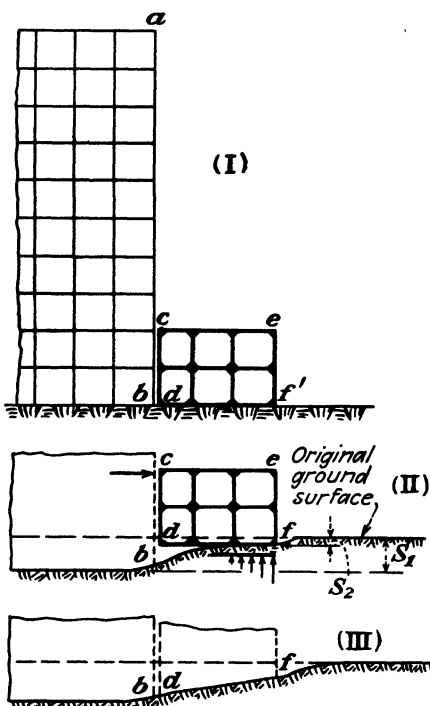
Sketch illustrating discussion of measures necessary to prevent damage to light parts of a building by the settlement crater around adjoining heavy parts of the structure.
